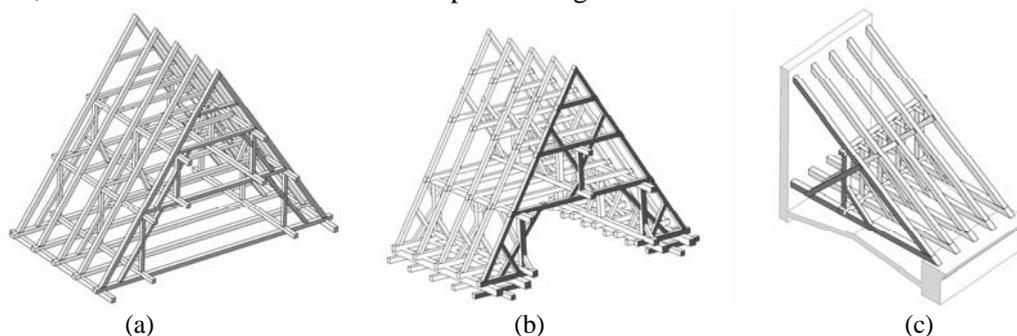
Gothic roof structures (a) on common rafters and tie-beams with collar beams, (b) on trestles, (c) on common rafters and plates
